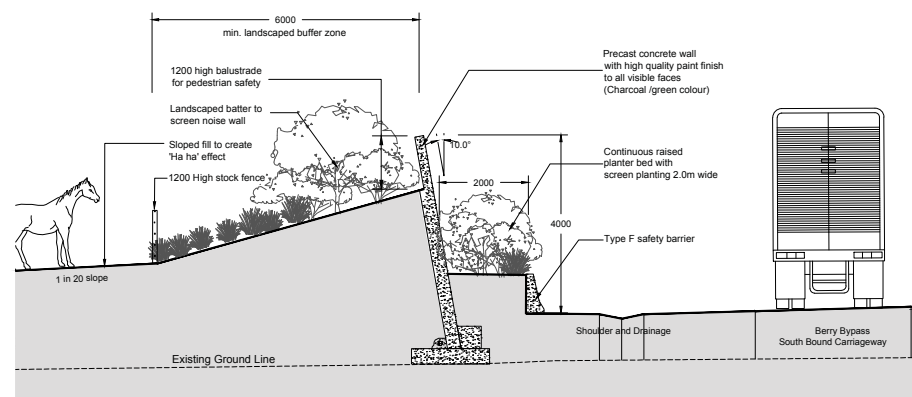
North Street noise barrier EA Concept Design option 1 – precast concrete wall
